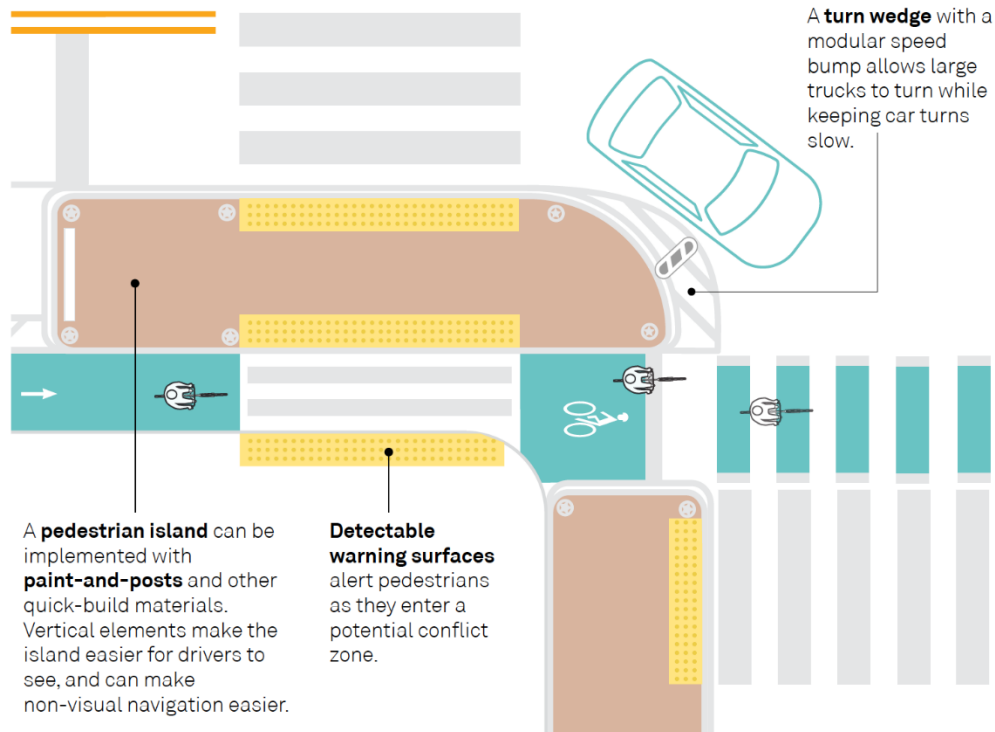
Retrofit-Style Intersection: Protected Bike Lanes on Major Road & Bike Lanes
